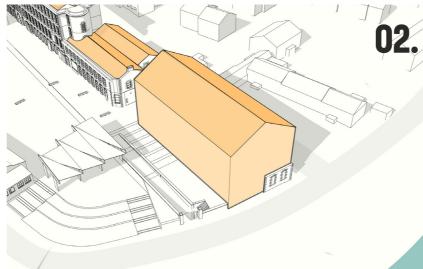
O'Callaghan Strand plot site layout diagram
